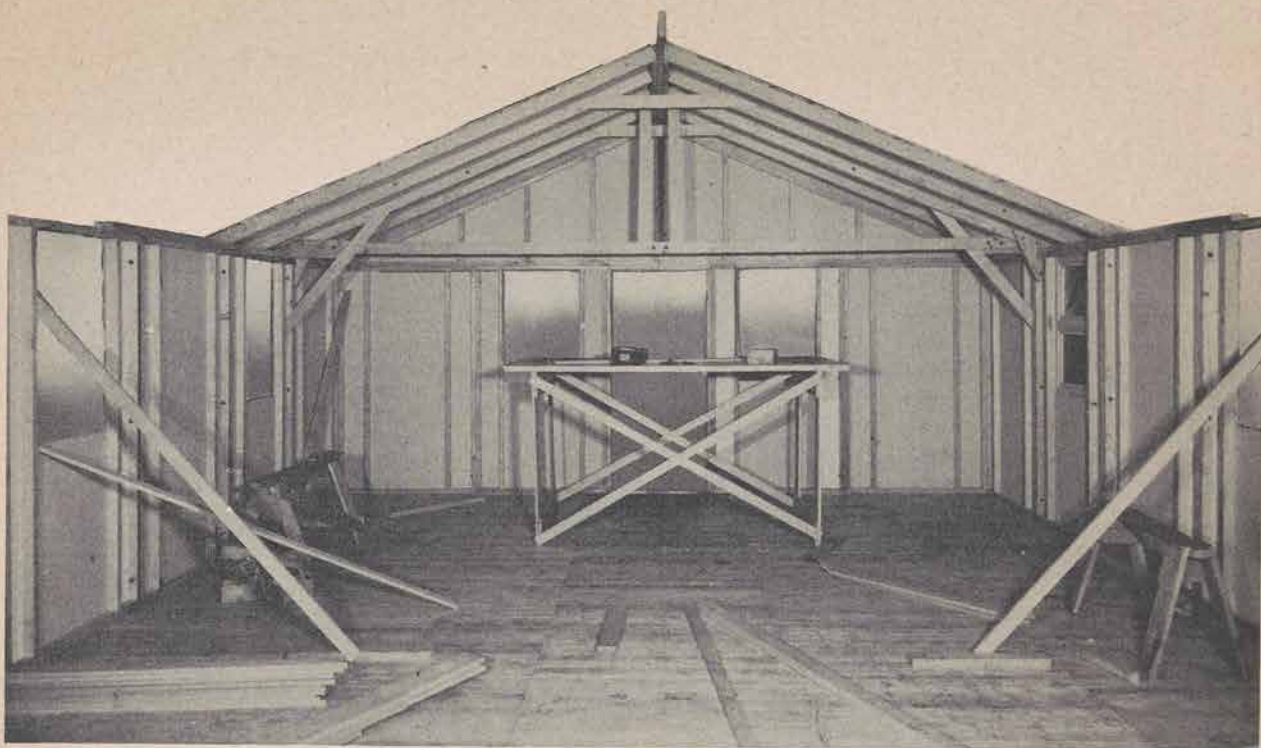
Four roof panels in place showing T-1 installed and scaffold platform made from step material.
